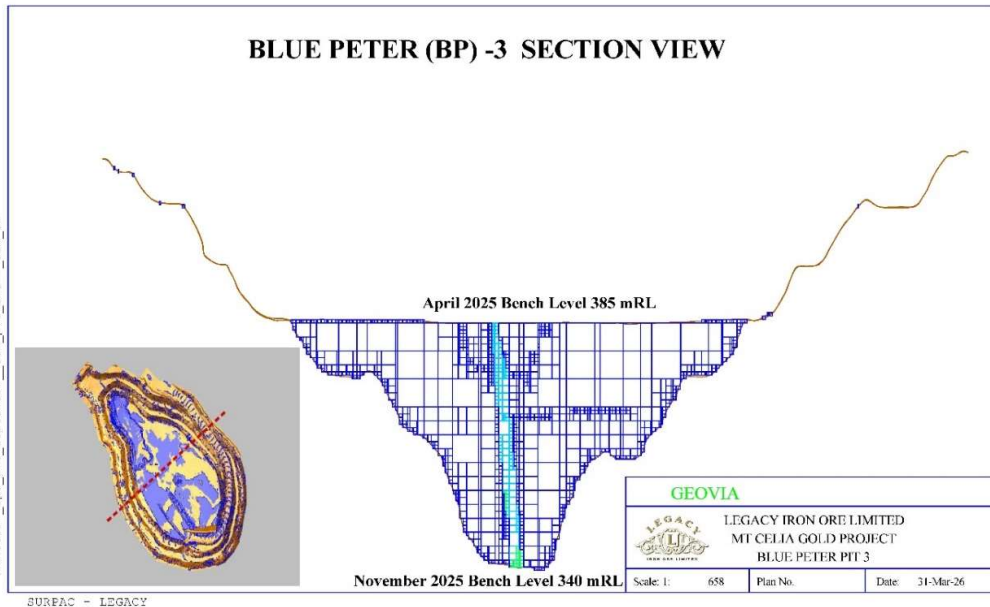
As built Sectional view of Blue Peter (BP- 3) pit.
